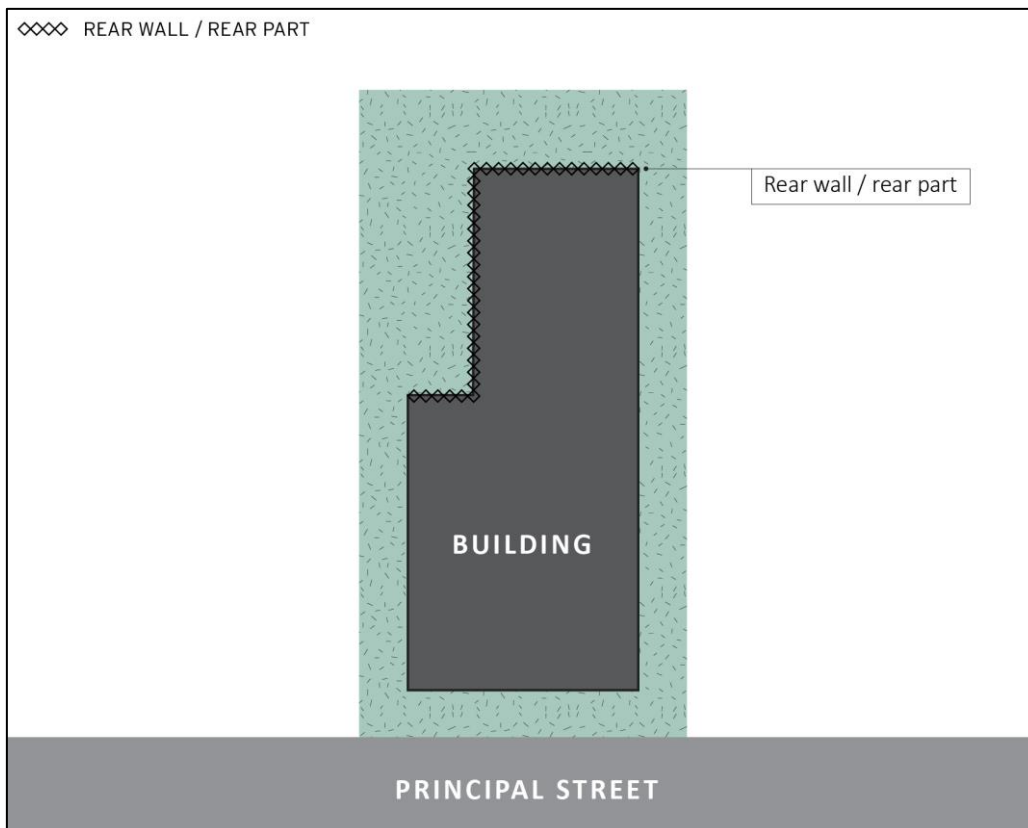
Modifications and alterations, including demolition, are exempt to the rear wall/rear part of building
